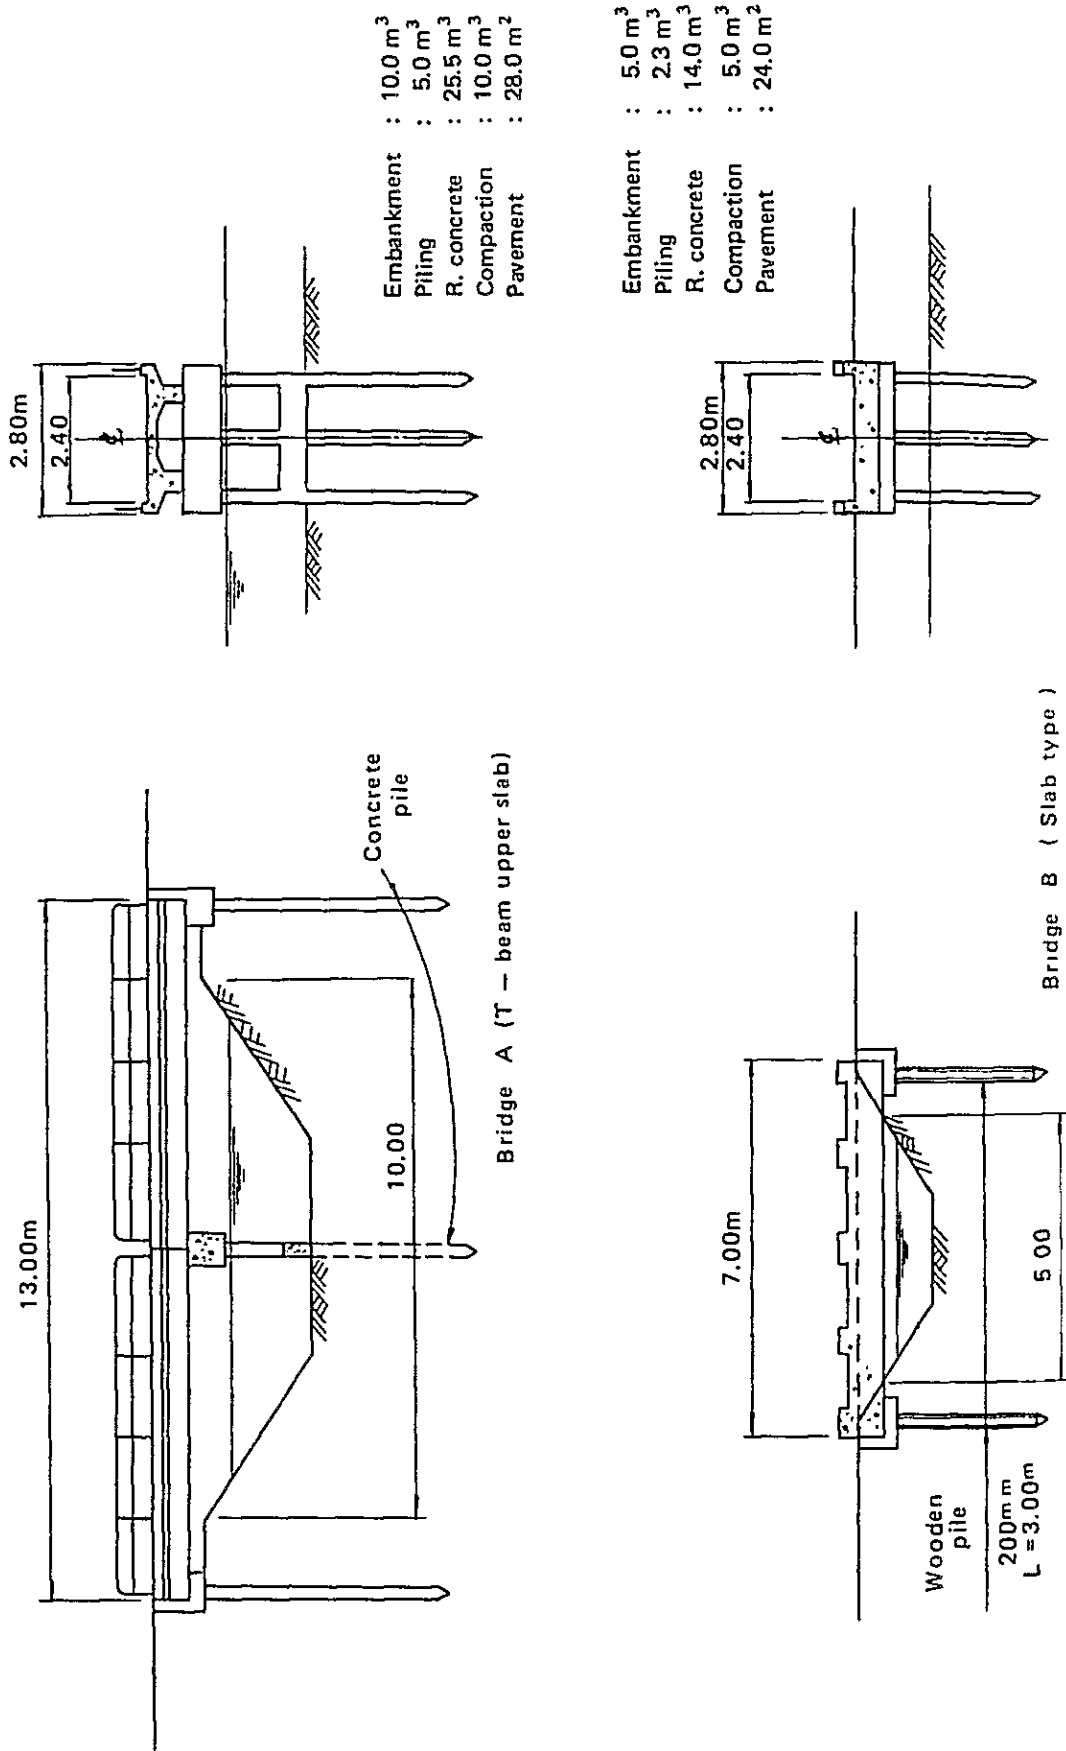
Typical Structure, Bridge for Feeder Canal
